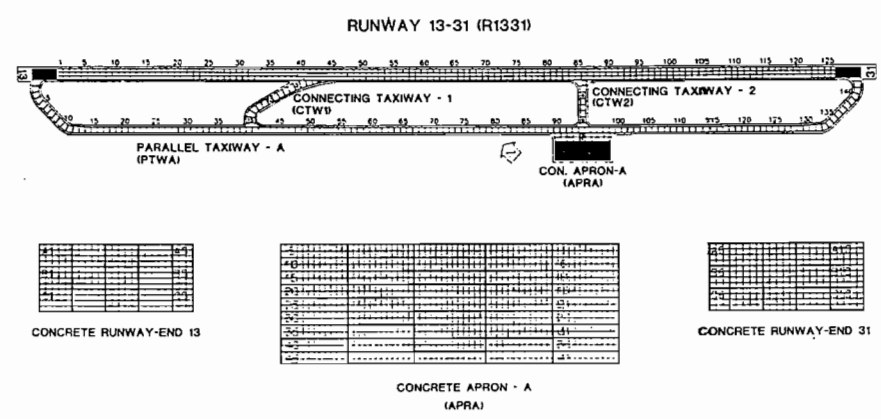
Example airfield pavement network divided into sample units. (From ERI Consulting Reports 1984)
